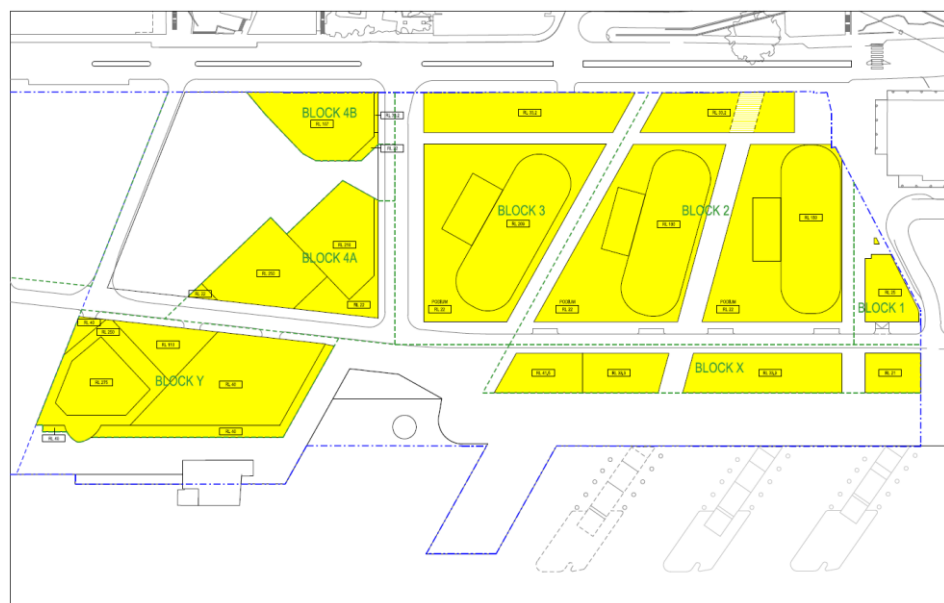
Concept Plan (Mod 8) proposed Development Block Layout
